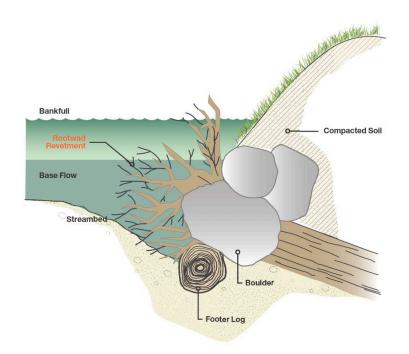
Streambank armoring via rootwad revetment – Harris County Flood Control District – Streambank Stabilization Handbook
